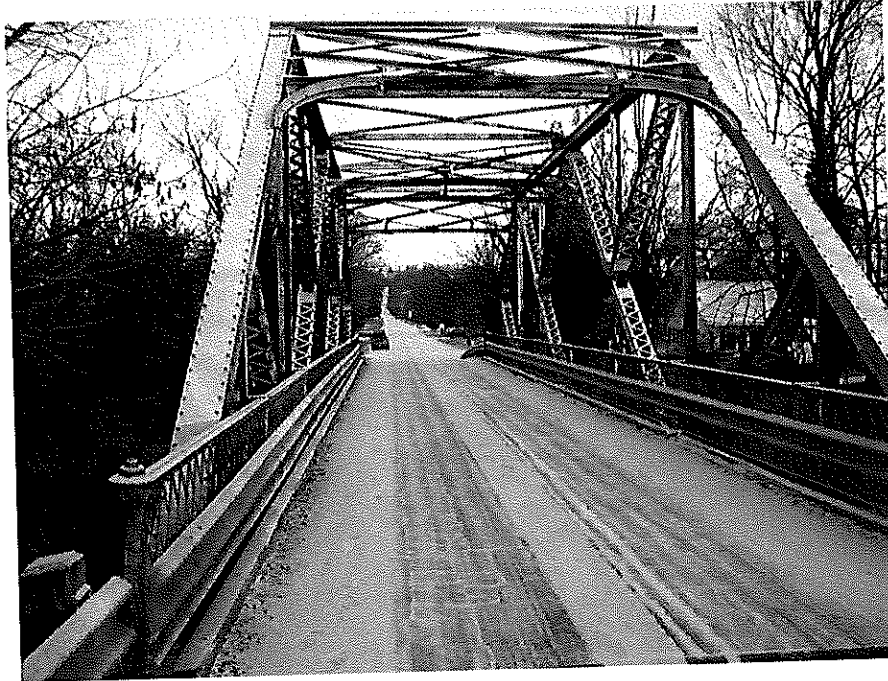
Collingwood Street Bridge (Bridge #000141) looking North from the South Edge of the Bridge
